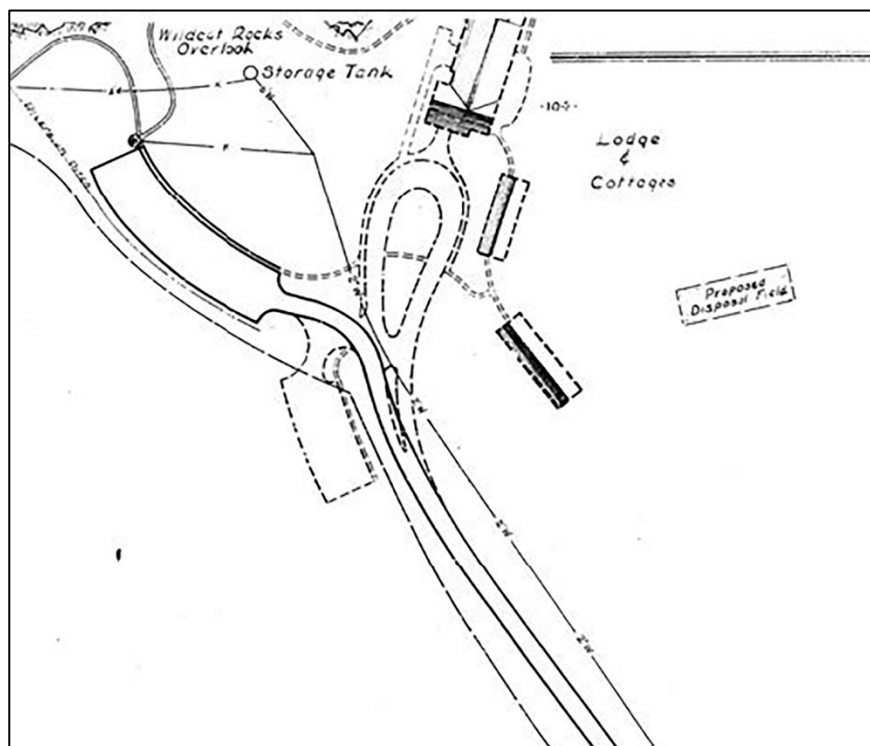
Portion of a 1943 Utility Layout Plan showing a proposed Lodge and Cottage configuration, 1943, DSC, TIC.
